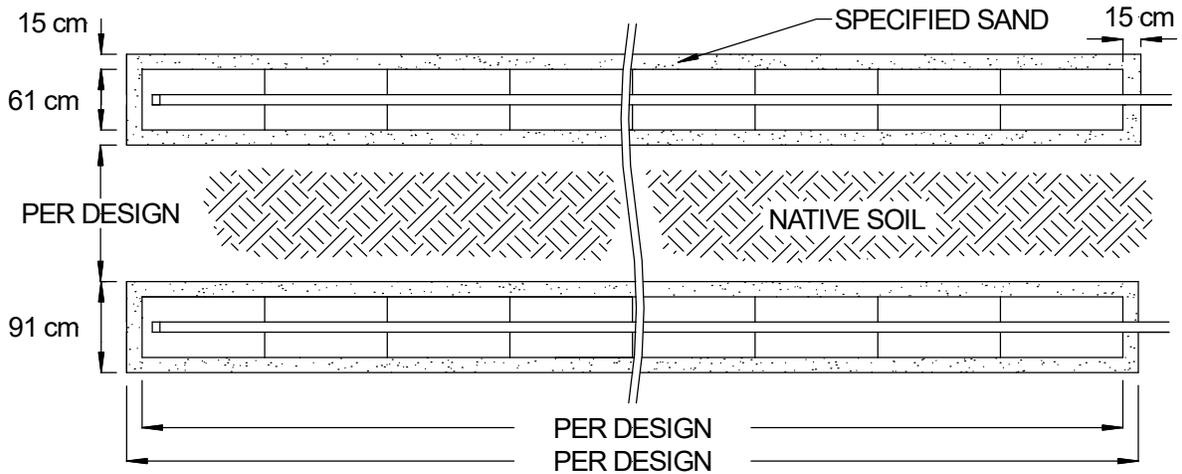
SECTION VIEW – TRENCH SYSTEM – LEVEL SITE
